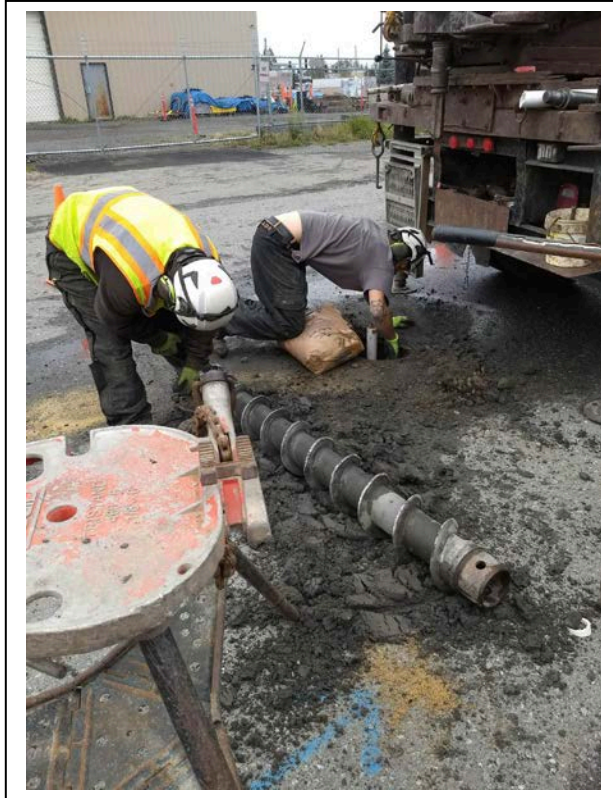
Looking southwest at the installation of Monitoring Well B9MW. (September 12, 2019)
